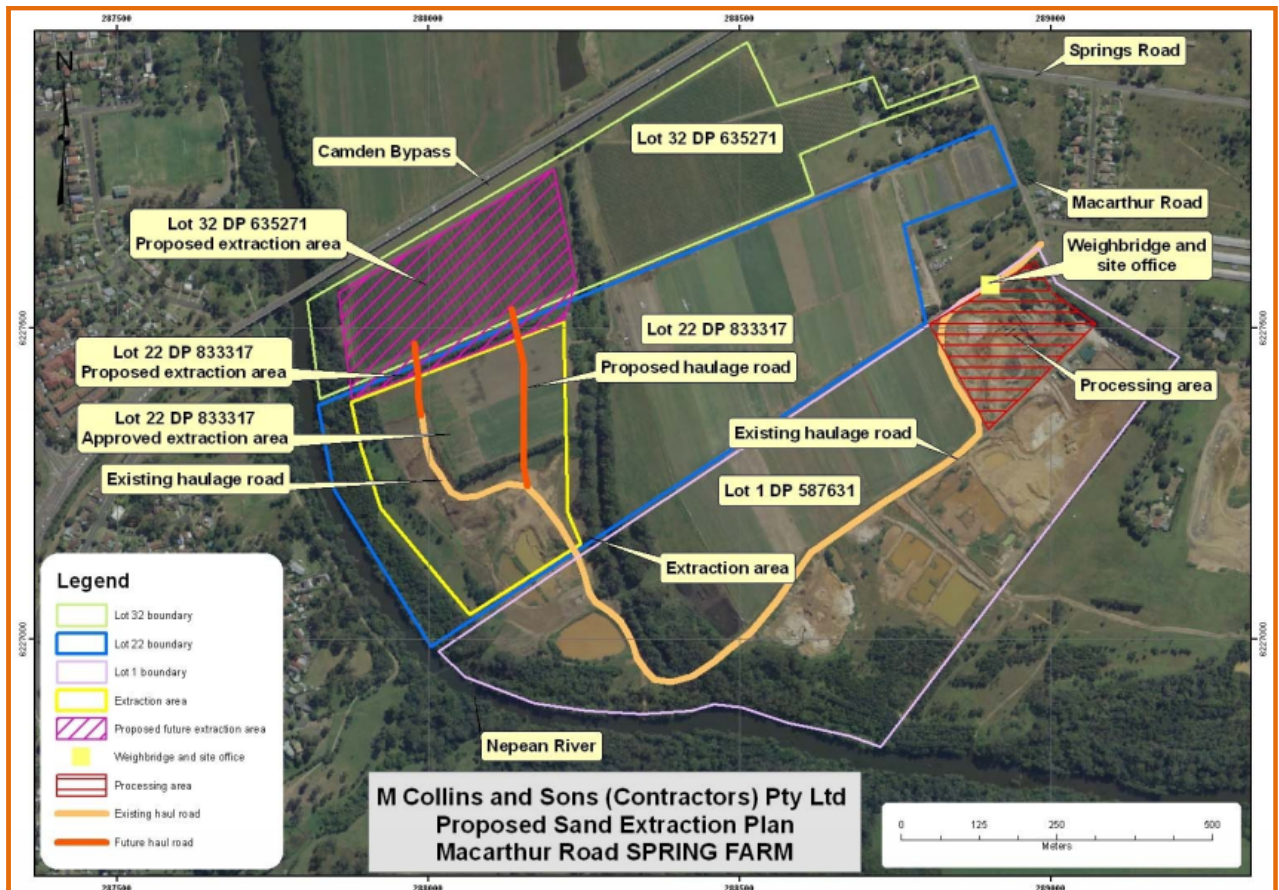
Site layout showing existing site features, and proposed sand/soil extraction area
